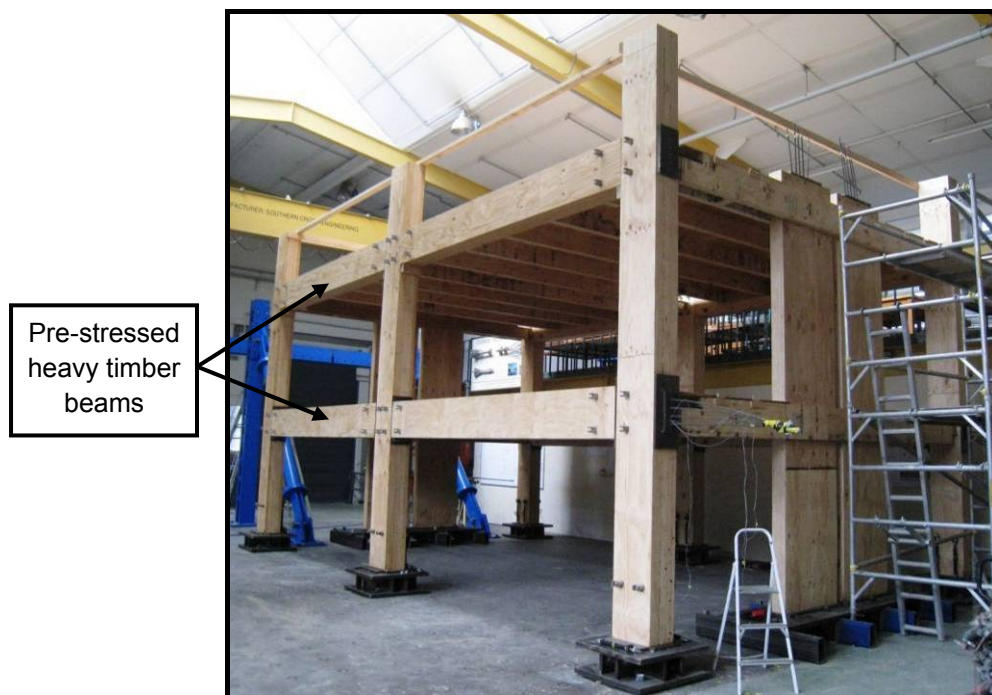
Two Storey Pre-Stressed Heavy Timber Model
